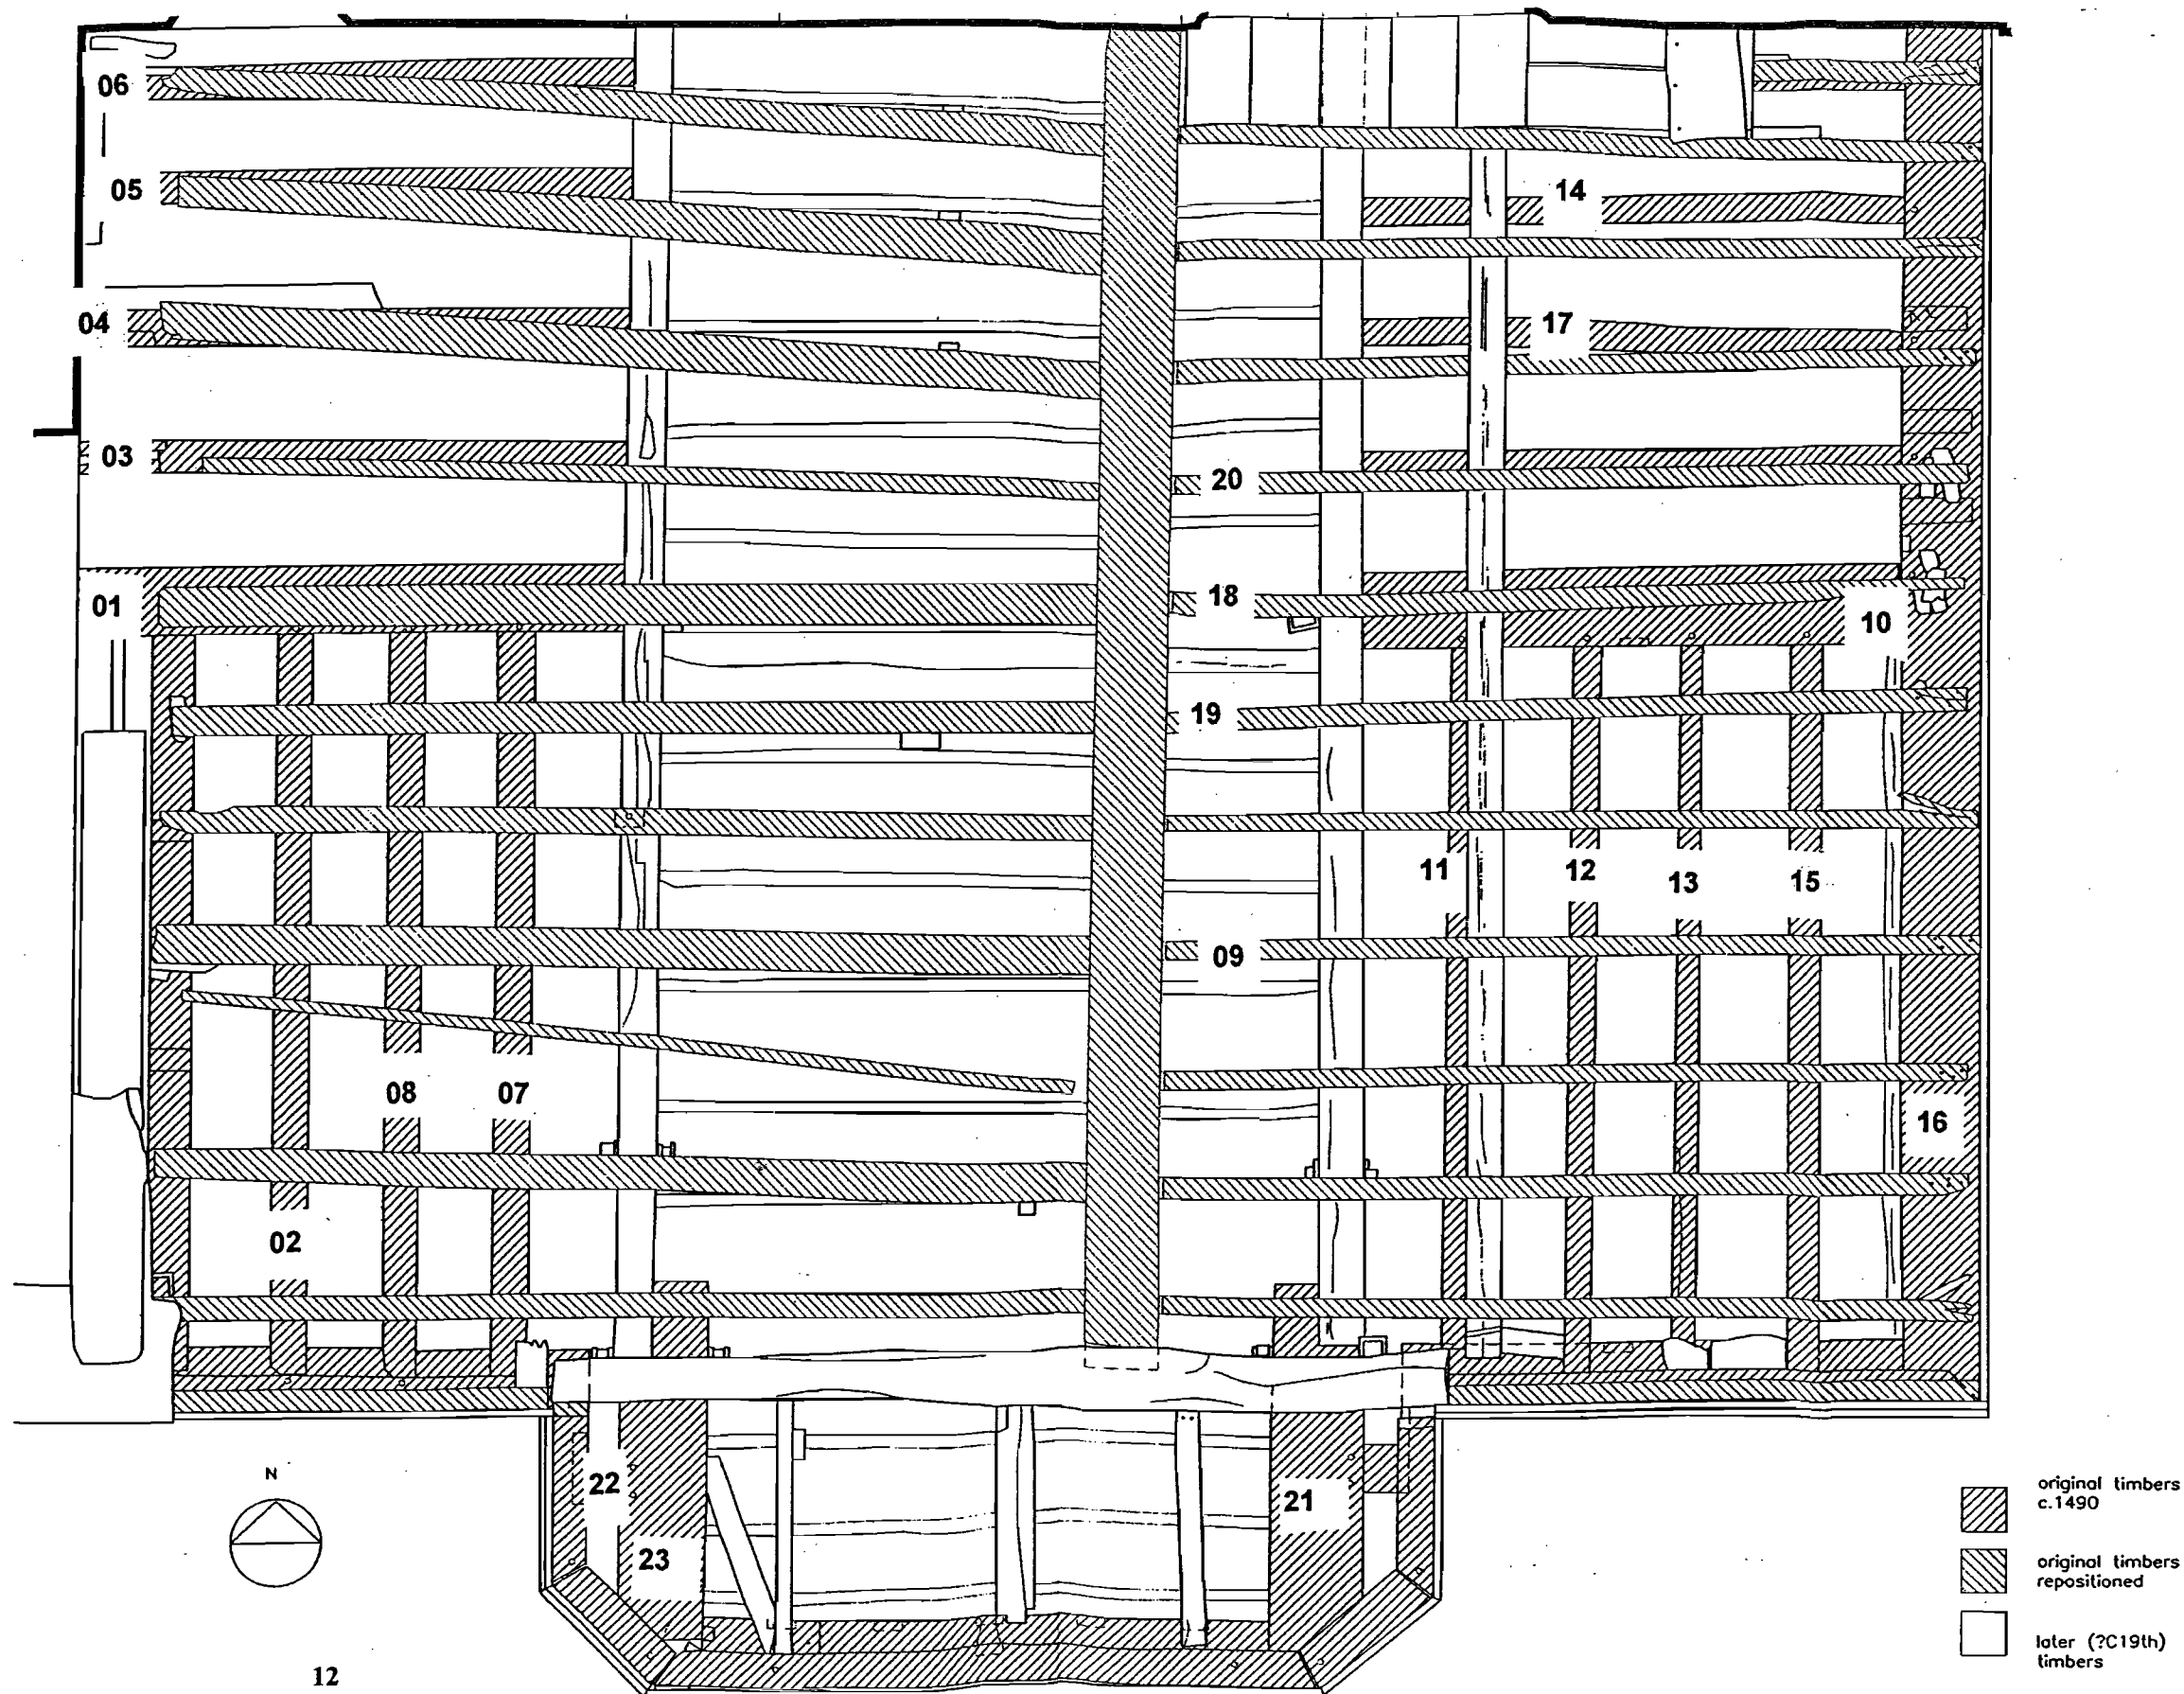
Section to show position of sampled timbers in the floor-frame of the Accounts Office
